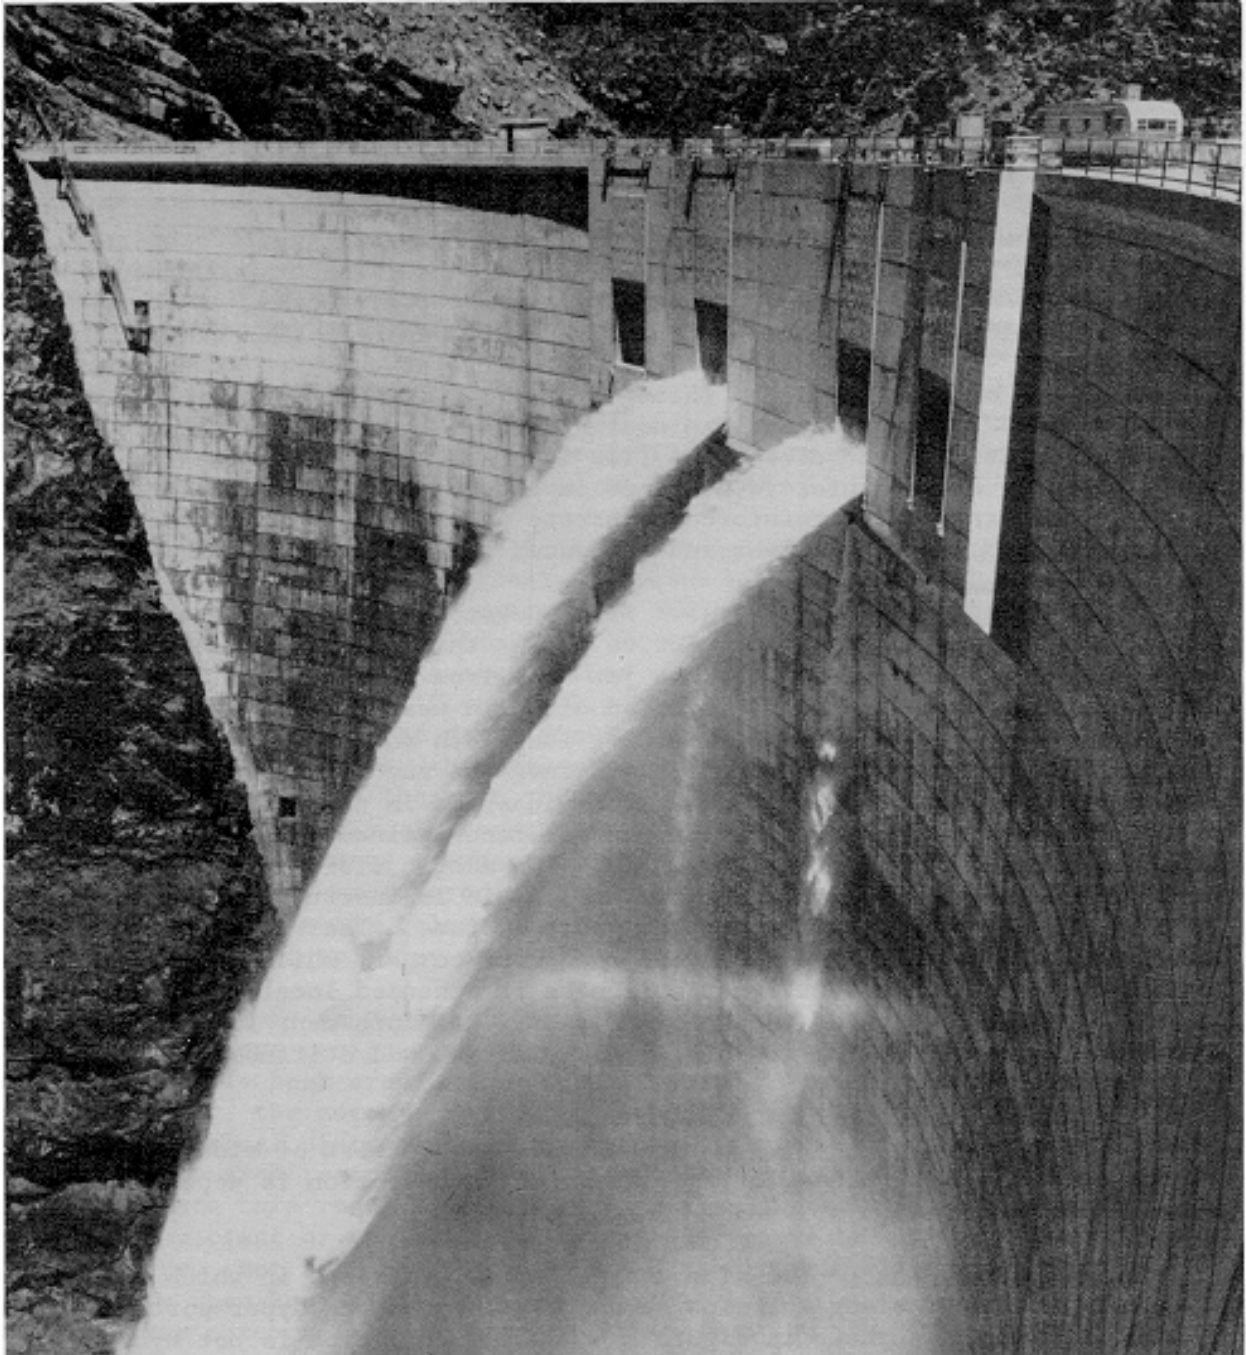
Through spillway below crest on Morrow Point Dam (USBR)
